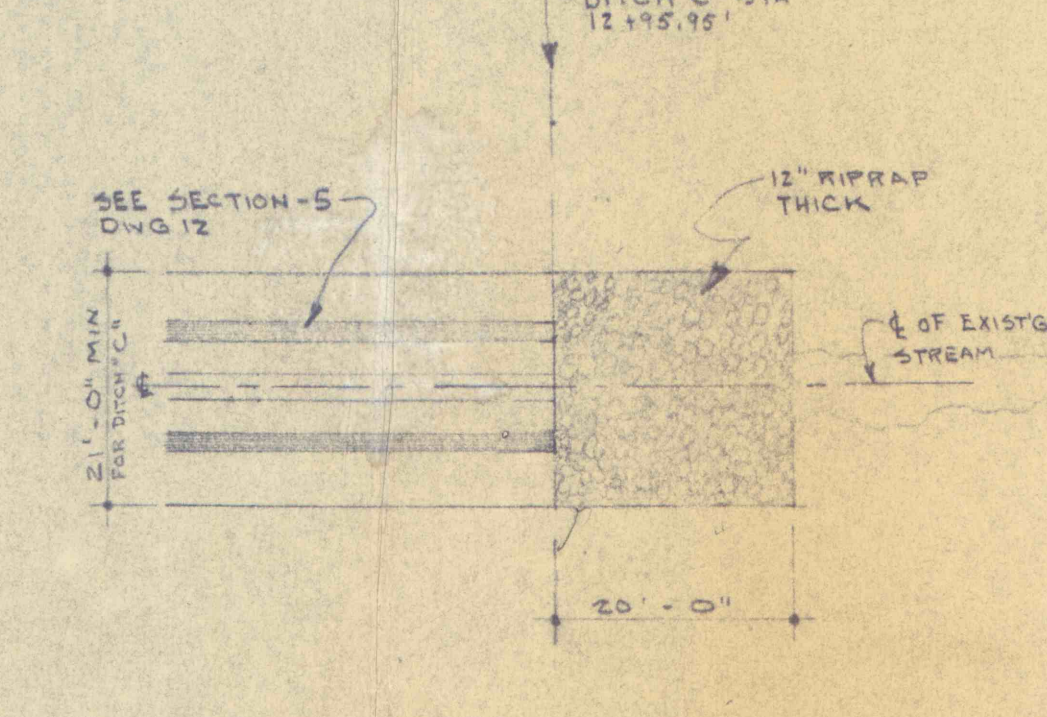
DETAIL OF CONN. DITCH "E" W/ "F" - (O)
